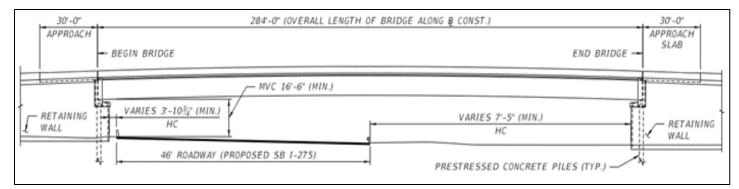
Elevation View of Proposed Southbound Bridge over C-D Road Ramp to I-75
